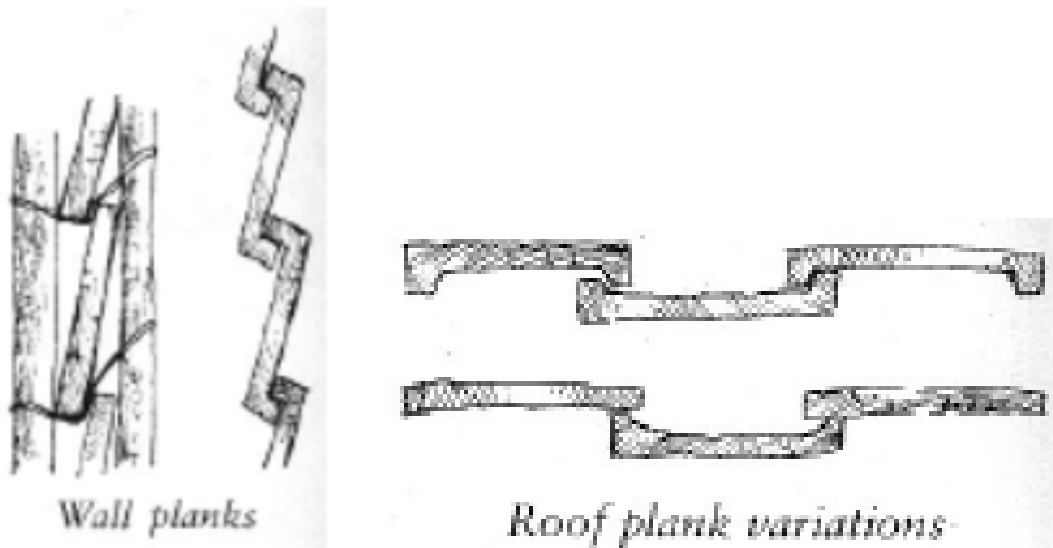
Diagrams of overlapping plank methods of wall and roof planks, from Nabokov and Easton, 1989.
